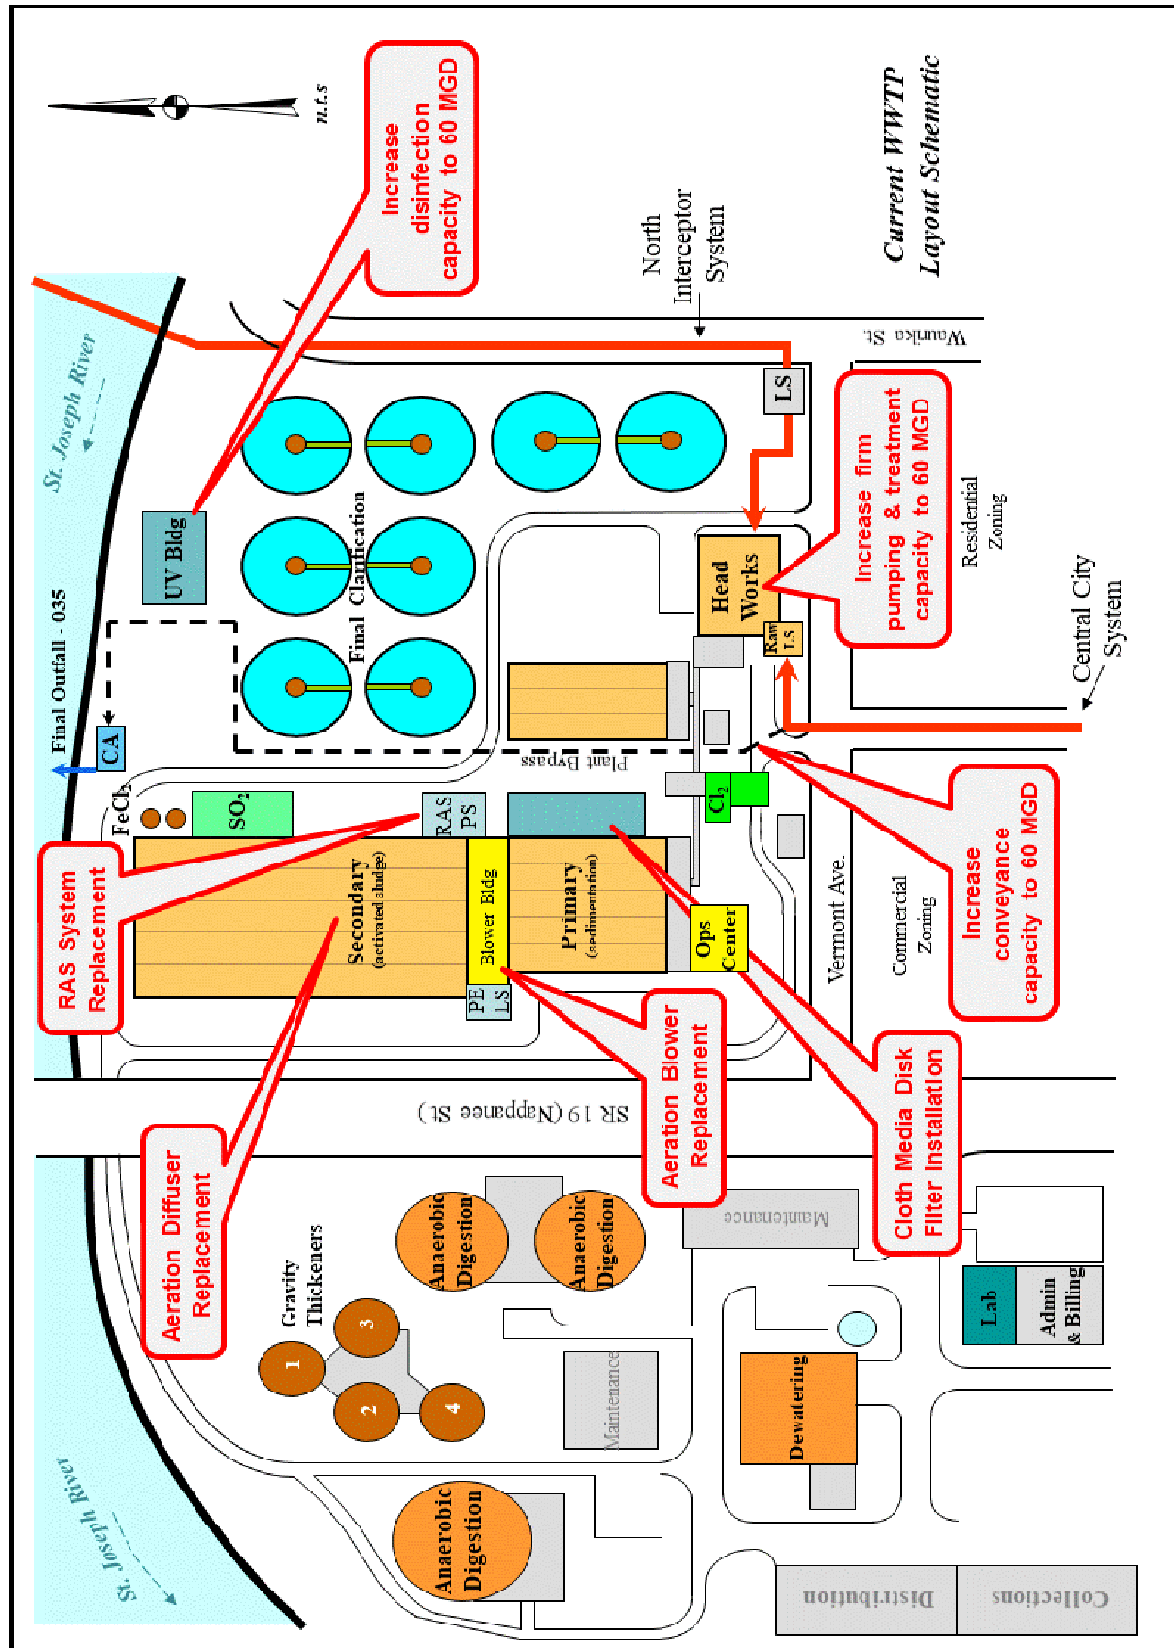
Schematic of Proposed Wastewater Treatment Plant Layout
